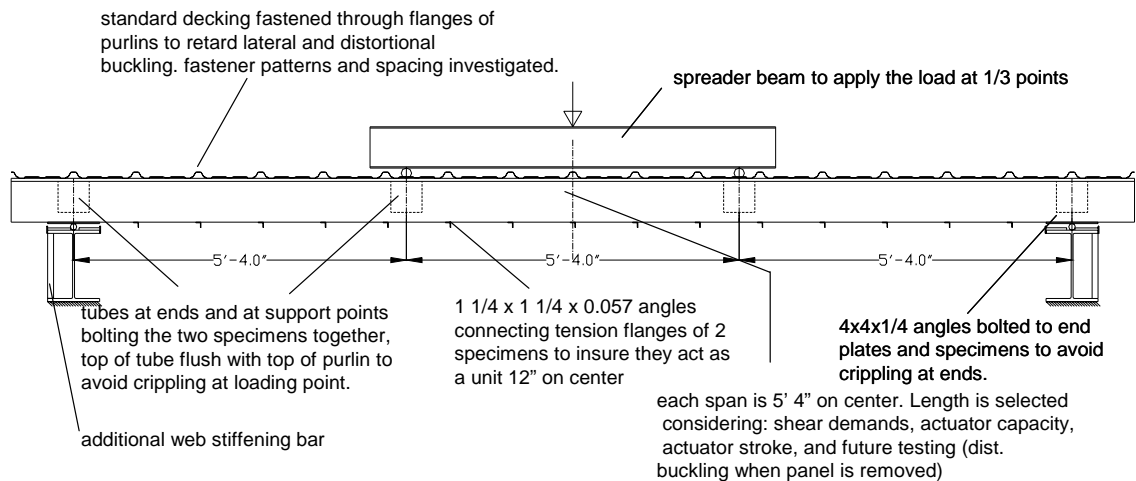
Elevation view of overall test arrangement for four point bending test
